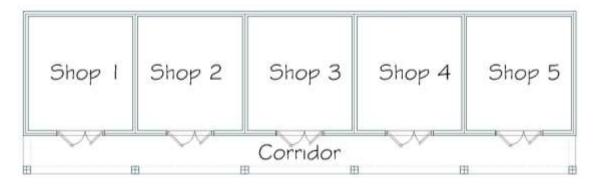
Typical ground floor plan of the lock-up shops in Kado market. Source: Field work (2017).
